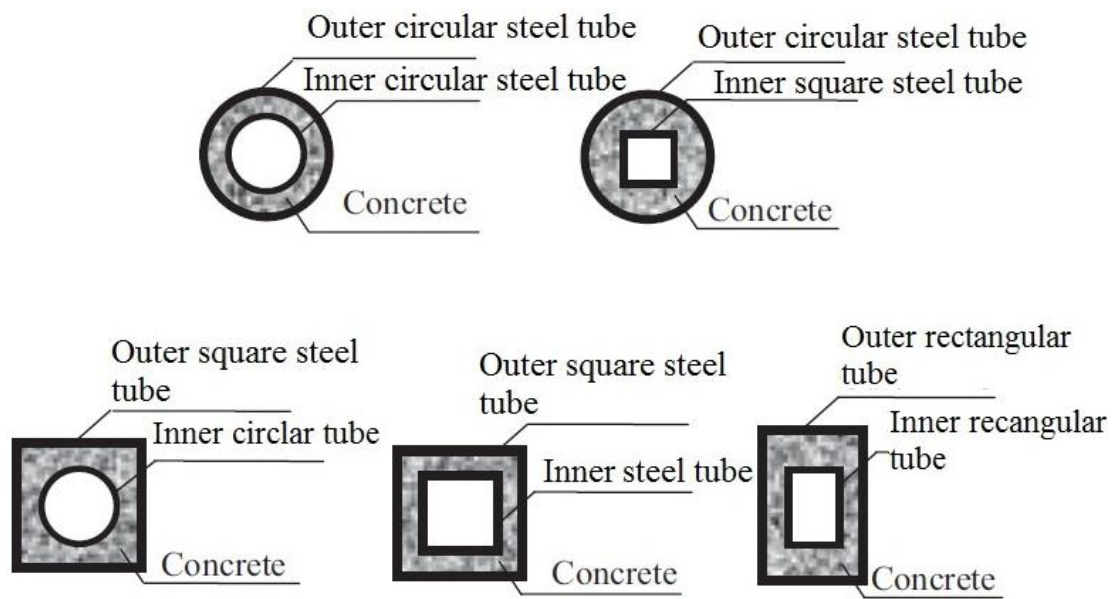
Various typical profiles of concrete filled double skin tubes sections (Lu et al., 2010)
